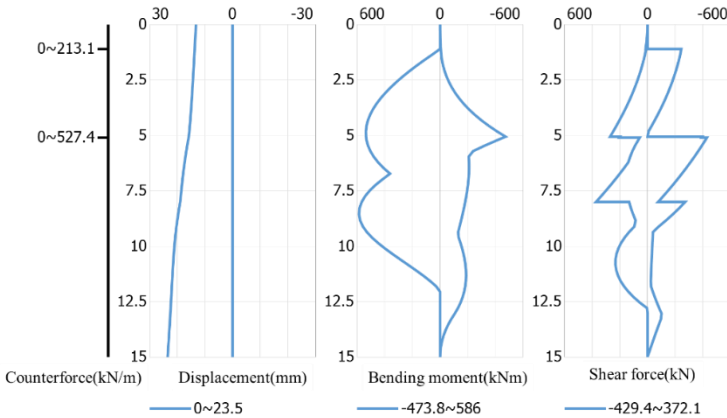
Working Conditions of Drilled Grouting Piles
